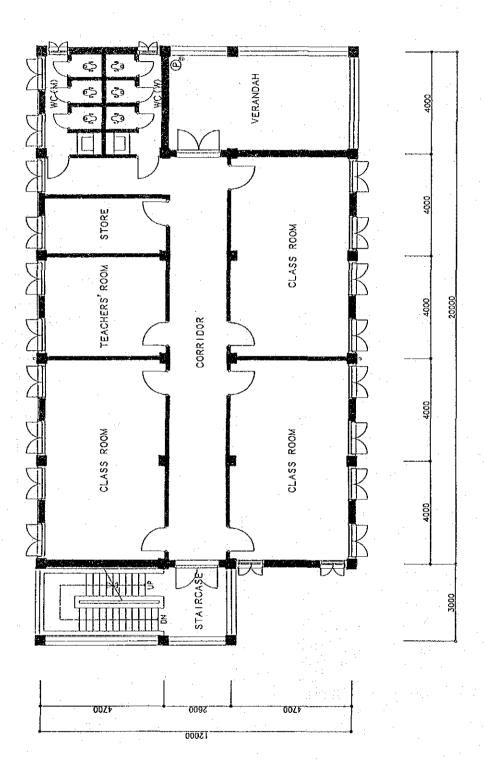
(2) FIRST FLOOR PLAN (3-CLASSROOM TYPE)
